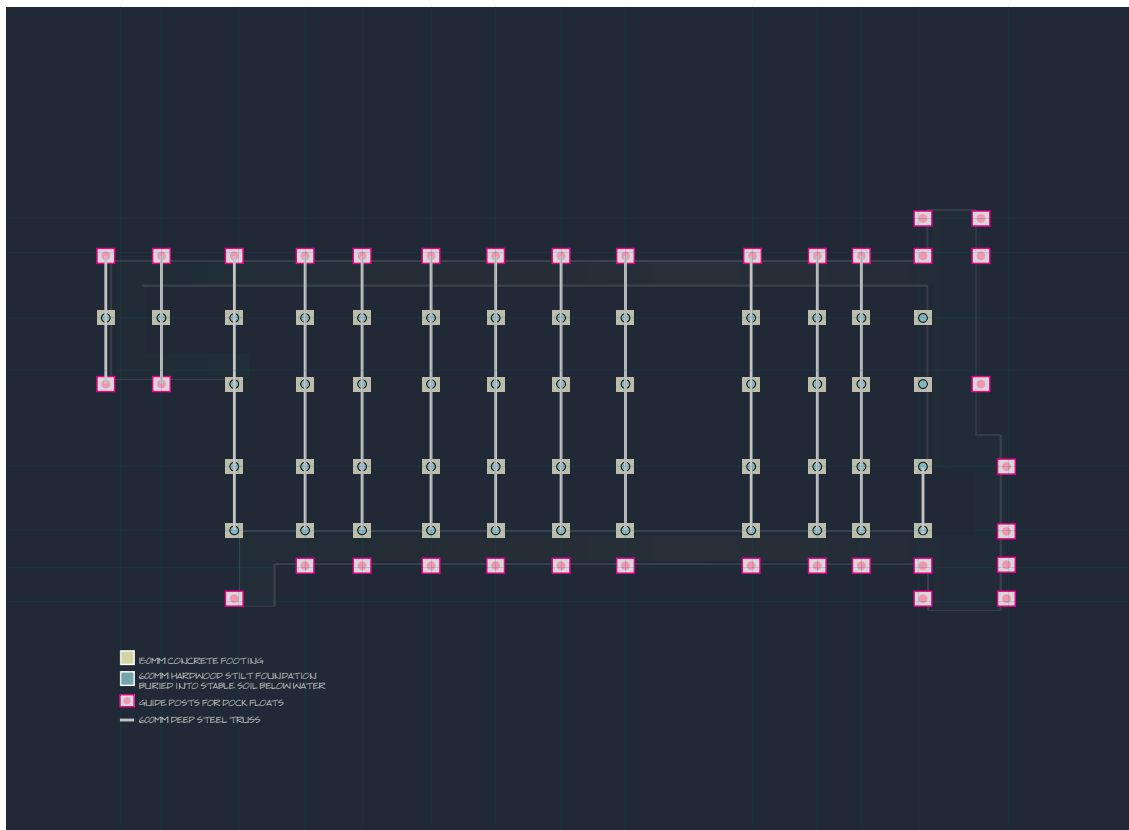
Structural foundation plan showing precise location of wooden pile foundation
